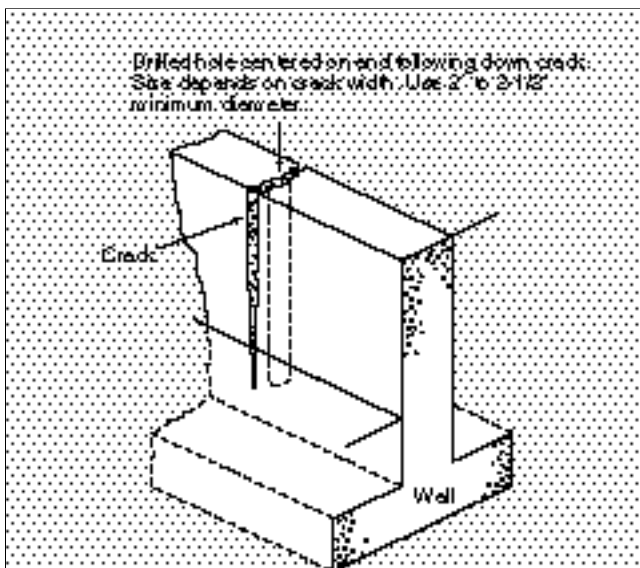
Drilling and plugging is a repair method well suited to vertical cracks in retaining walls. The repair material becomes a structural key to resist loads and prevent leakage through the crack.
